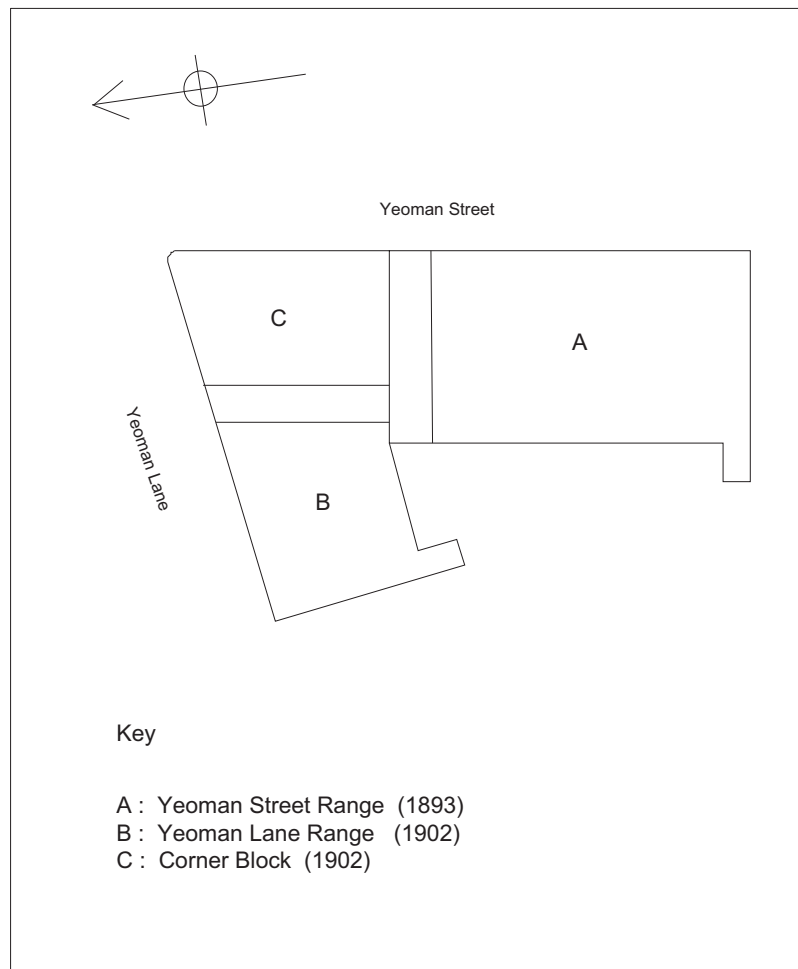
The extant buildings: plan of the main built elements and their dates. Not to scale.
